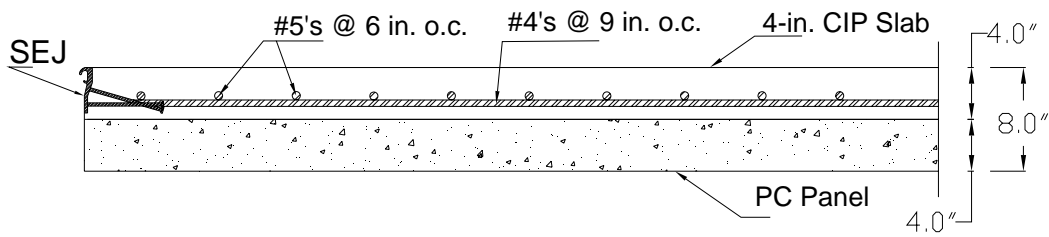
Cross Section view of Proposed PC Panel Detail
